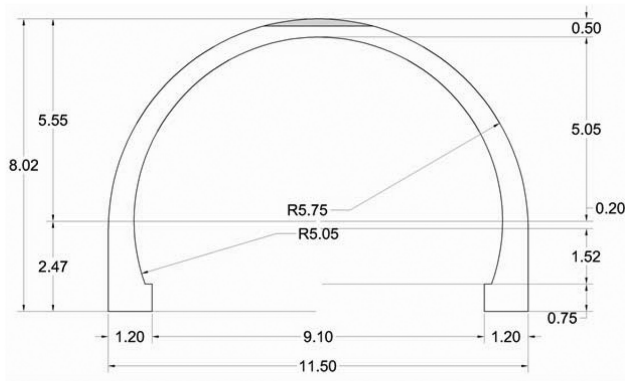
Typical road tunnel cross-section considered in the analyses (dimensions are in m).
